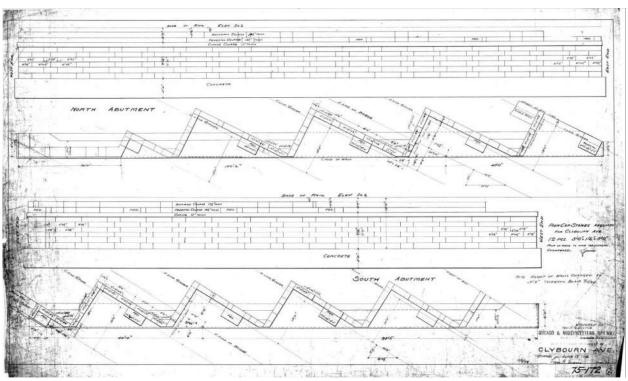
Clybourn Avenue North and South Abutment Plan and Elevation
